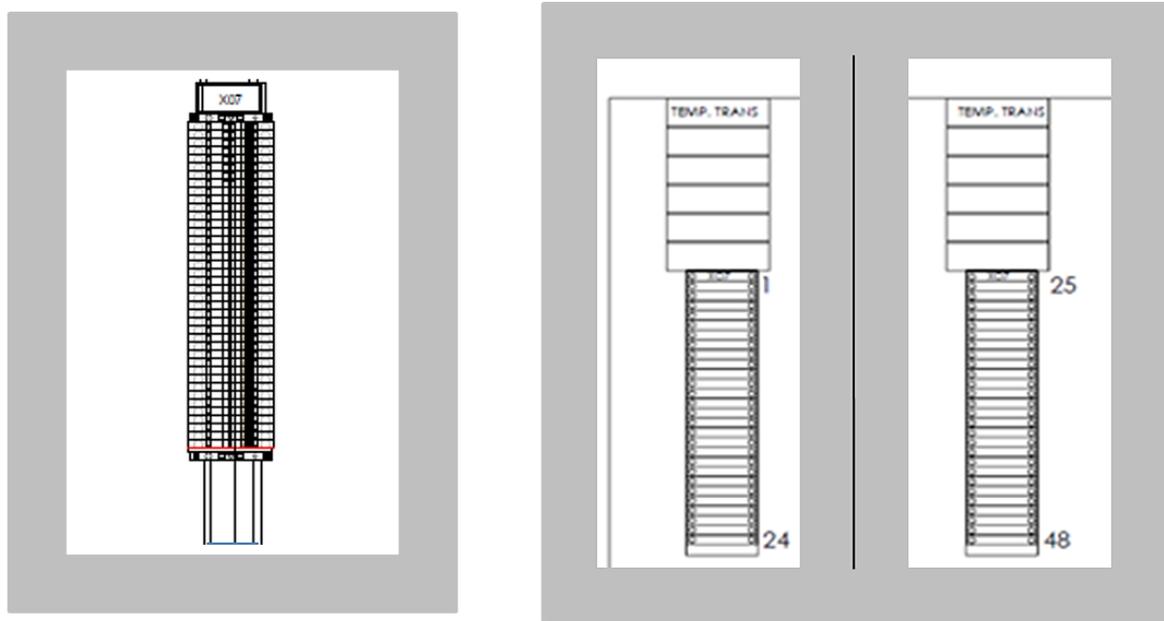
Junction Box Typical Internal Terminal and Trunking Layouts
